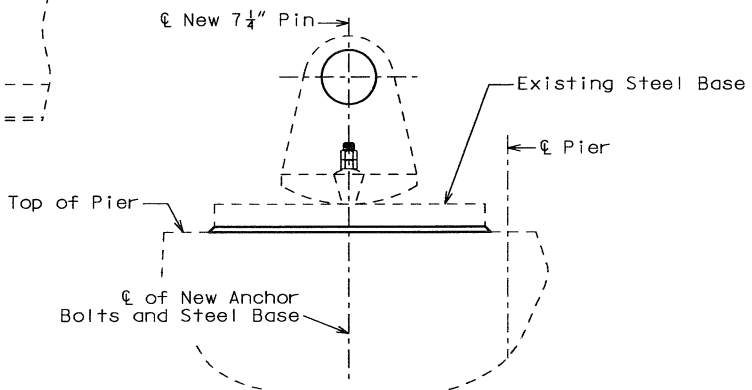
DETAIL OF ROCKER BEARING AND TRUSS SHOWING NEW HOLE LOCATION TO BE BORED
